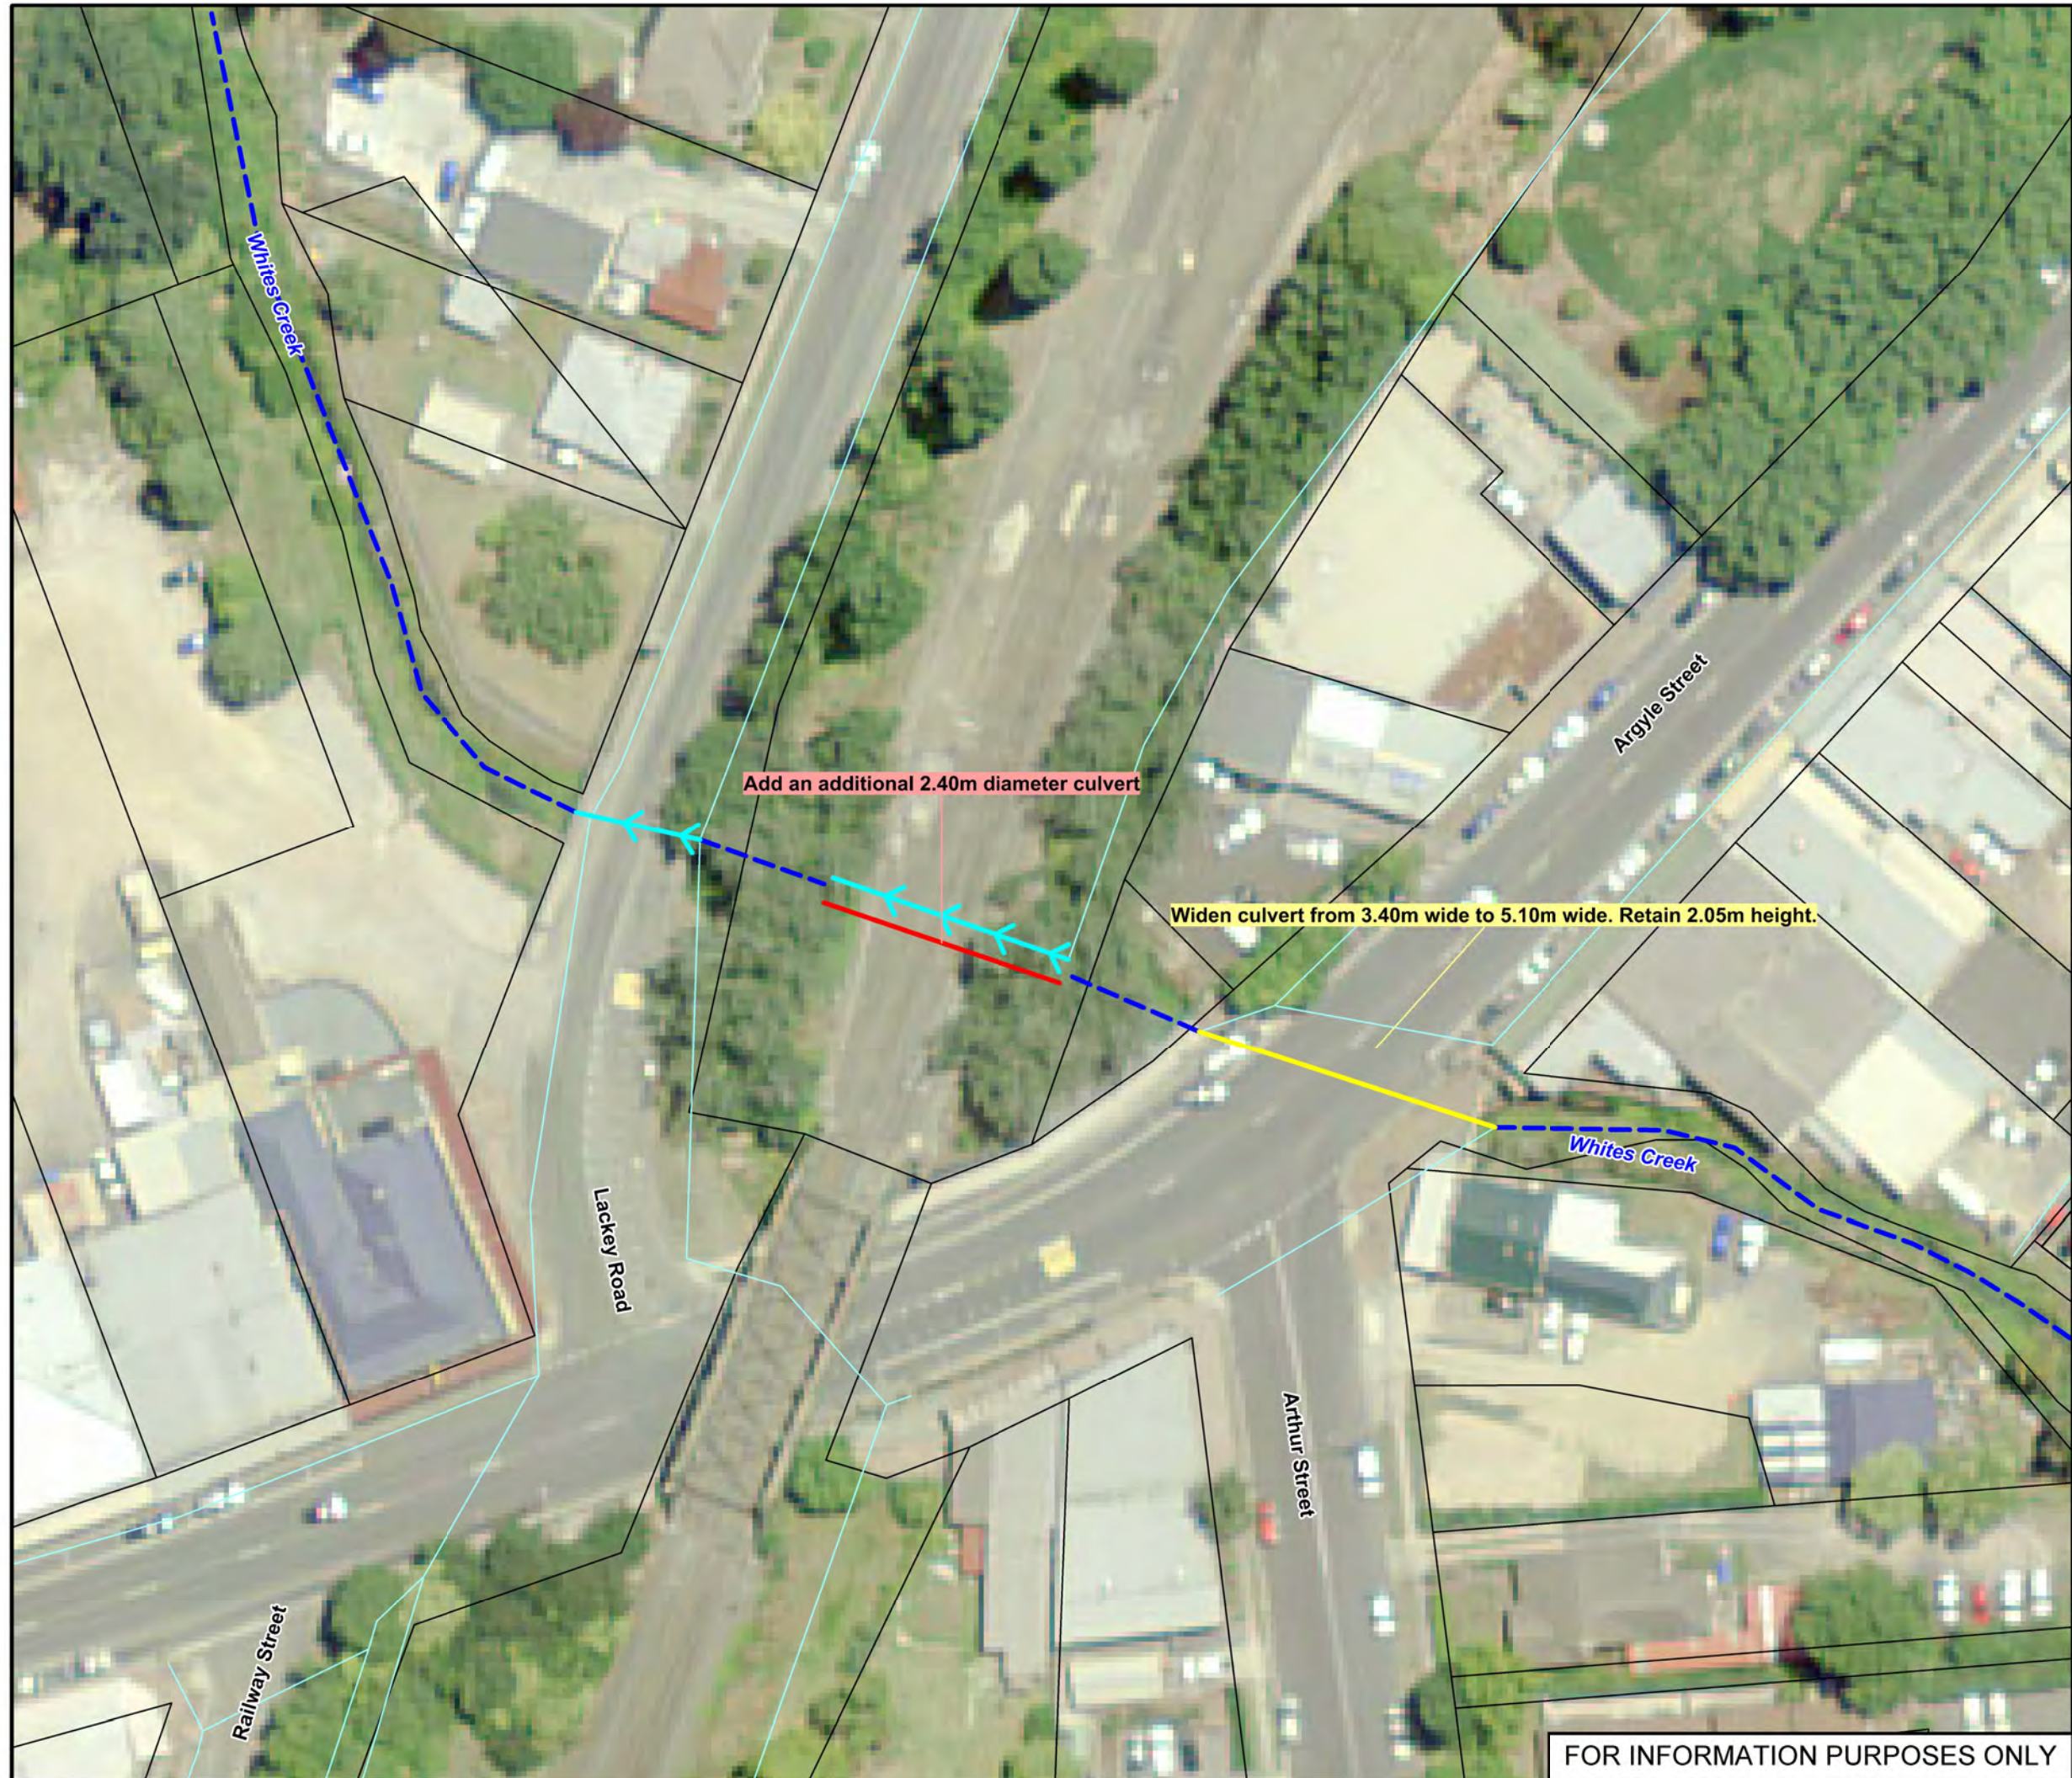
Concept Design to Upgrade Stormwater System along Argyle Street near Railway Street and Arthur Street (FM4)
